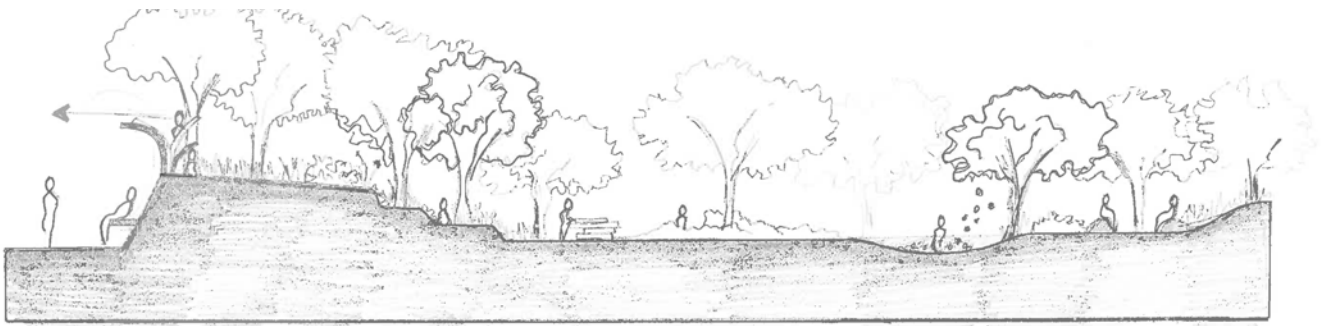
Development of sketch plan through exploring in section (Author, 2017)
